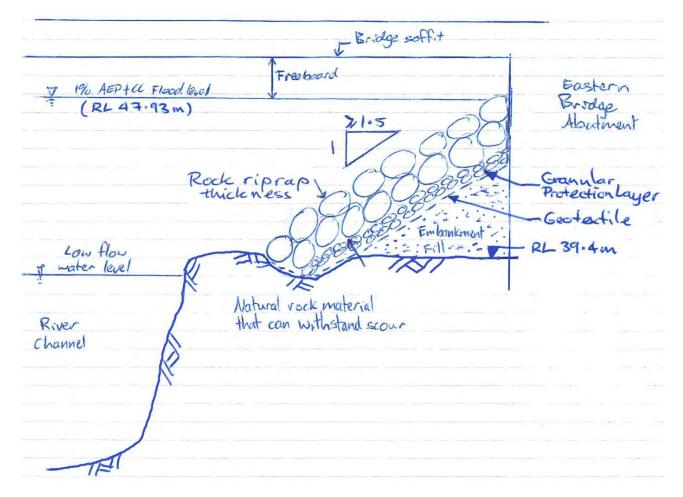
Sketch of rock revetment design at south corner of eastern abutment
